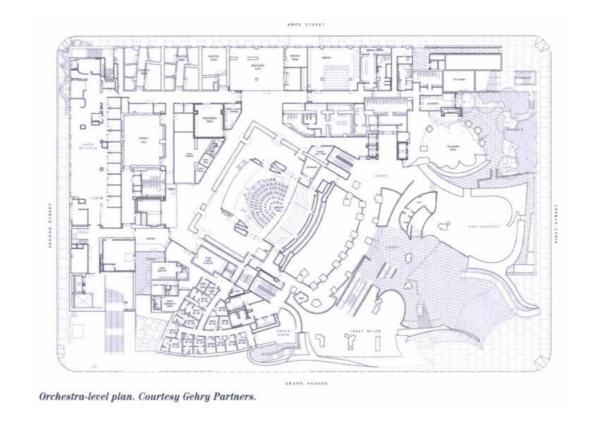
Orchestra-level Plan of Walt Disney Concert Hall, Courtesy Gehry Partners.<sup>56</sup>
